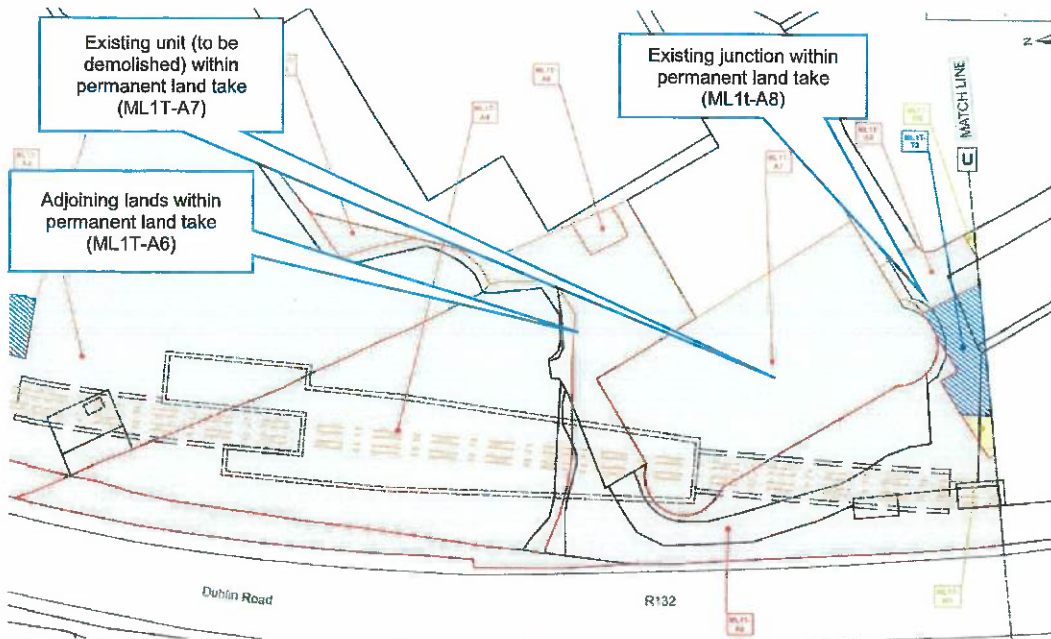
Extract from drawing 'Railway Works MetroLink – Property Details Airside Shopping Centre (Sheet 1 of 2)' – permanent land take in grey, temporary land take in blue, and proposed wayleaves in yellow
